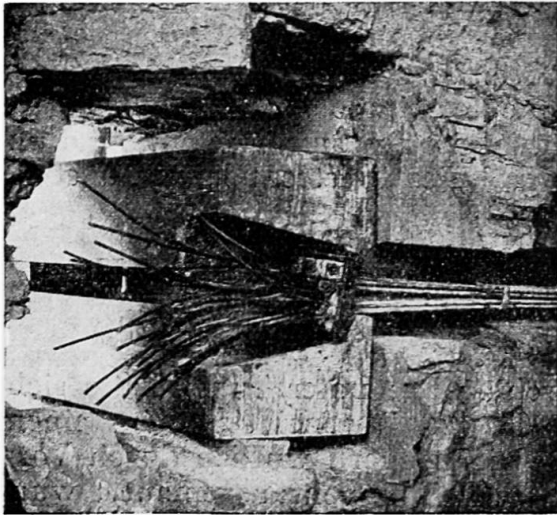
Tensioned wires at the anchorage at the end of the chase (see fig. 3).
